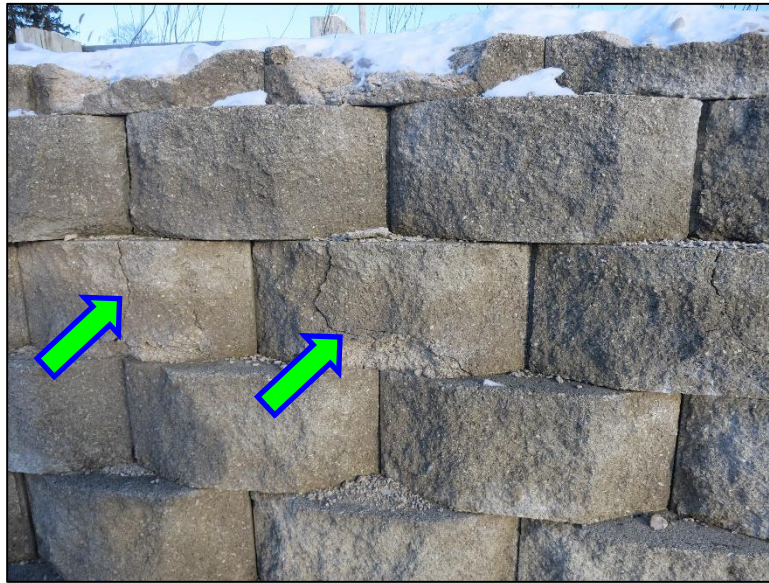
Vertical Cracking through the Front Face of a Block Unit.
